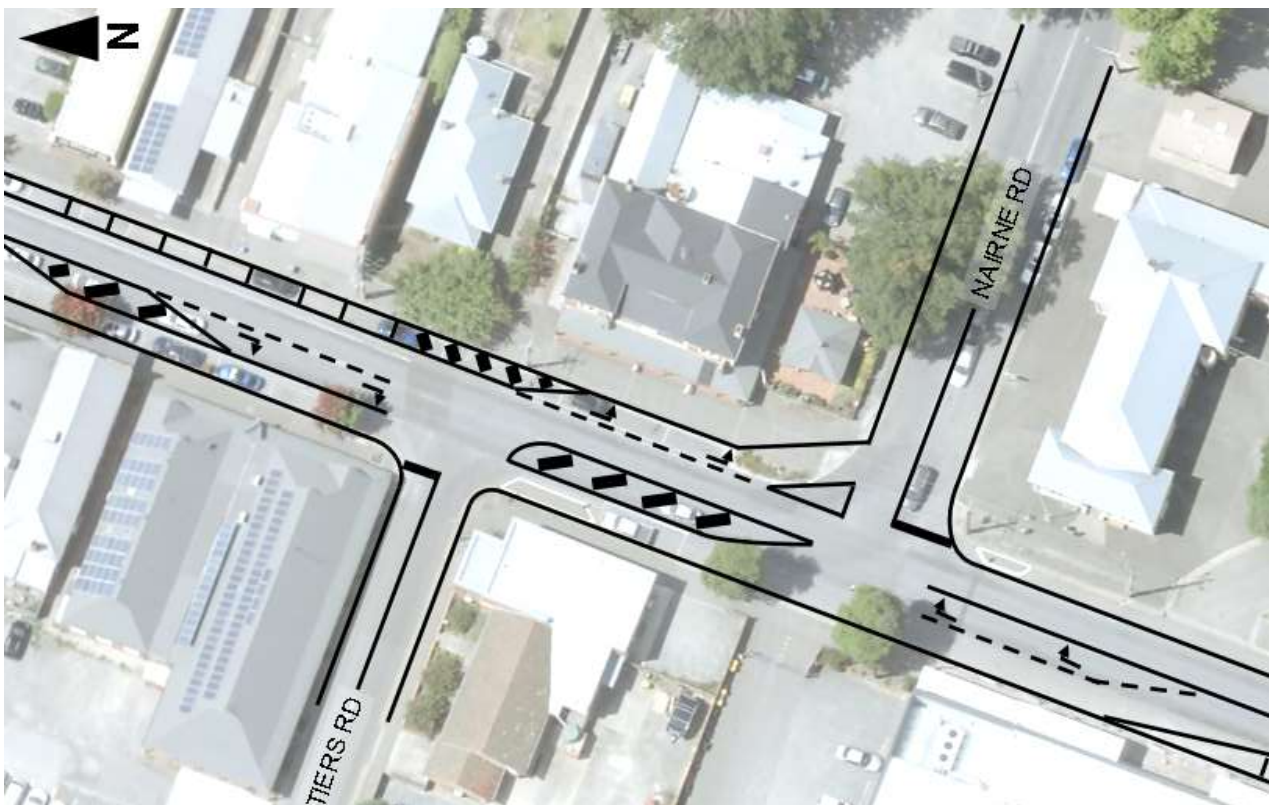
RAA concept sketch for un upgraded intersection with Tiers Road and Nairne Road in Woodside
